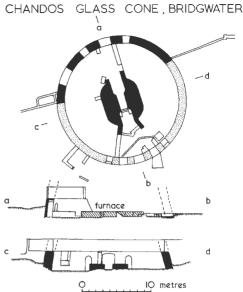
Glass cone excavation plan and section (reproduced from SANH 122 (1978), 145)
